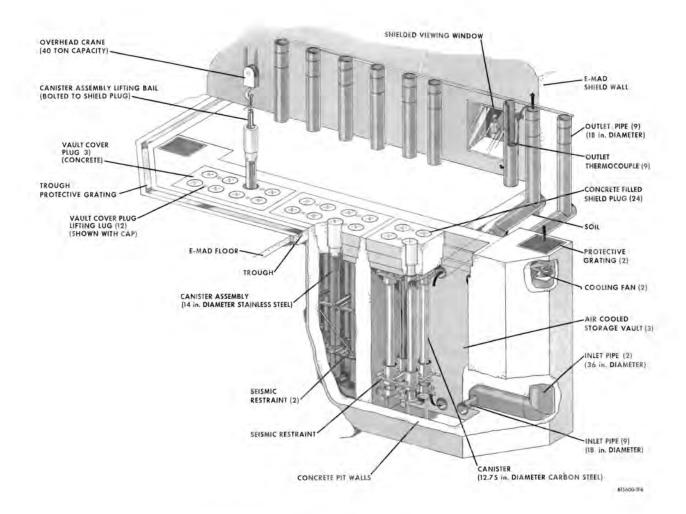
E-MAD Lag Storage Pit Configuration
